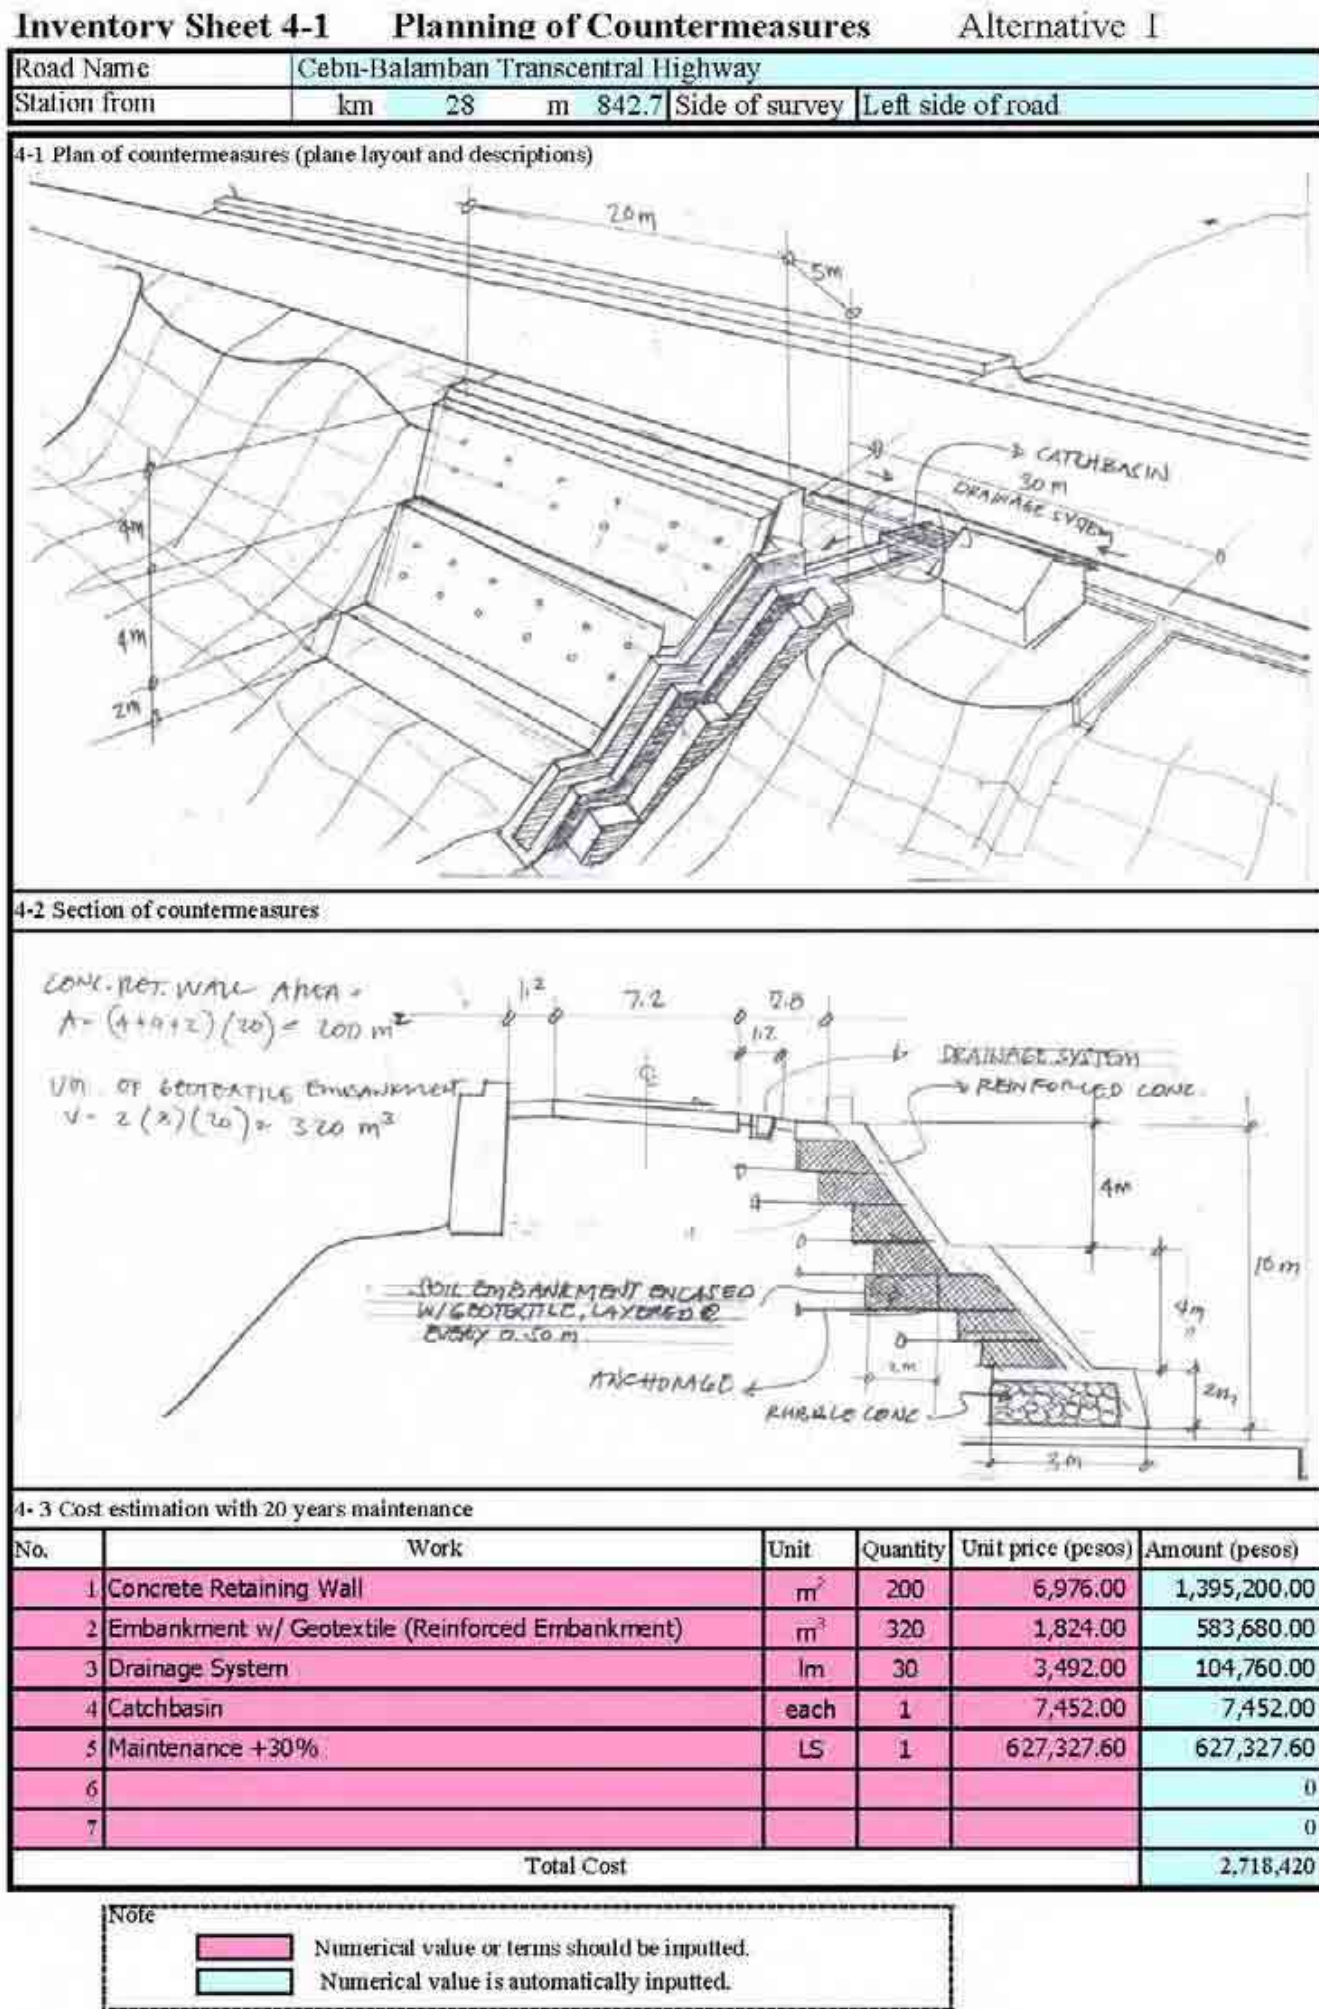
Example of Inventory Sheet 3: Planning of Countermeasure Alternative I for Road Slip
